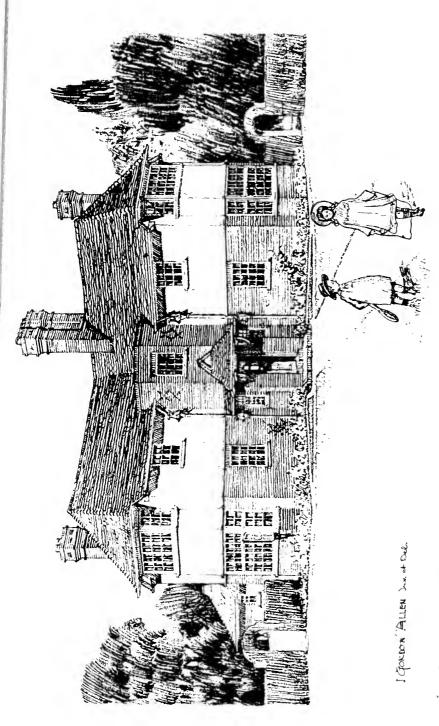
This is another drawing of the house at Barrow-on-Humber (see Figs. 33 and 34), showing the materials as first suggested. It was proposed to build the ground floor walls with 11 in, cavity brickwork, and the upper storey with 9 in, brick walls covered with roughvast. The porch opens into an octagonal hall, which is emphasised exteriorly, and has a hood roofed with tiles, and supported on oak brackets.
